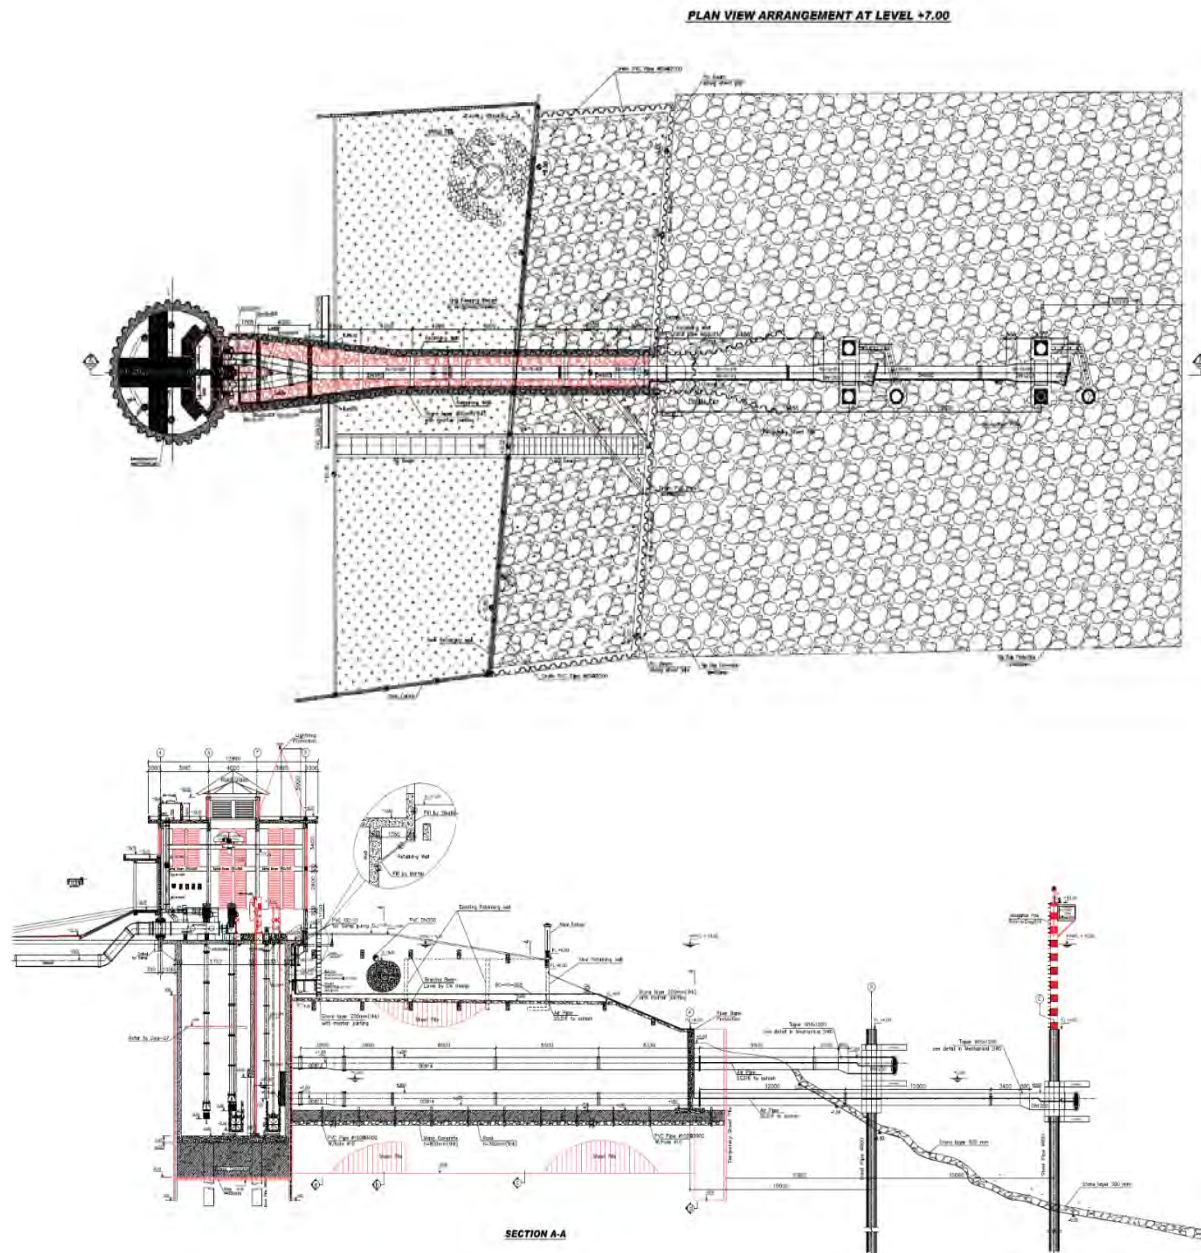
General Layout of Chamcar Mon Raw Water Raw Water Intake Facilities
